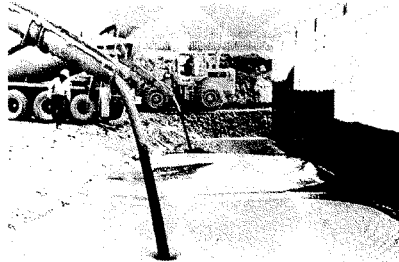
Using CLSM to backfill adjacent to building foundation wall.
